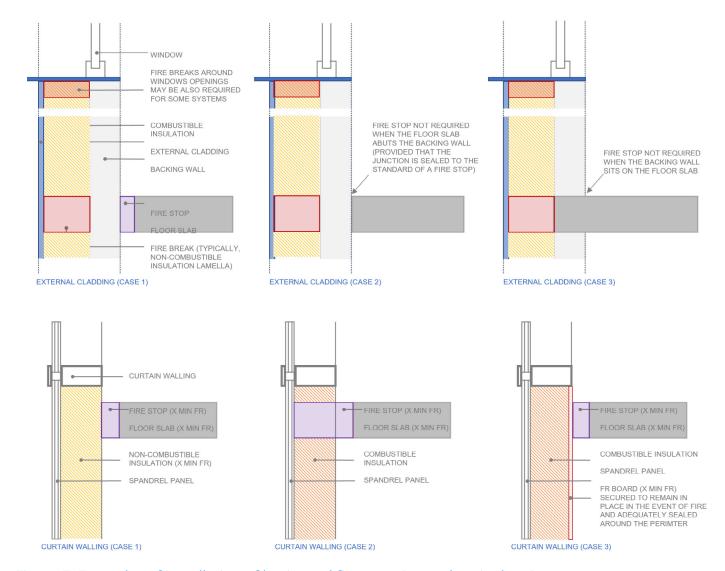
Examples of installation of horizontal fire stopping and cavity barriers
